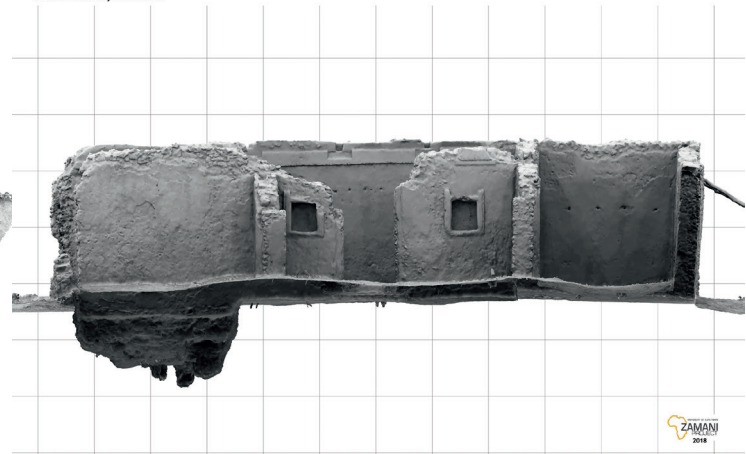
3D scan of House 5 and elevation/ section (a & b).
